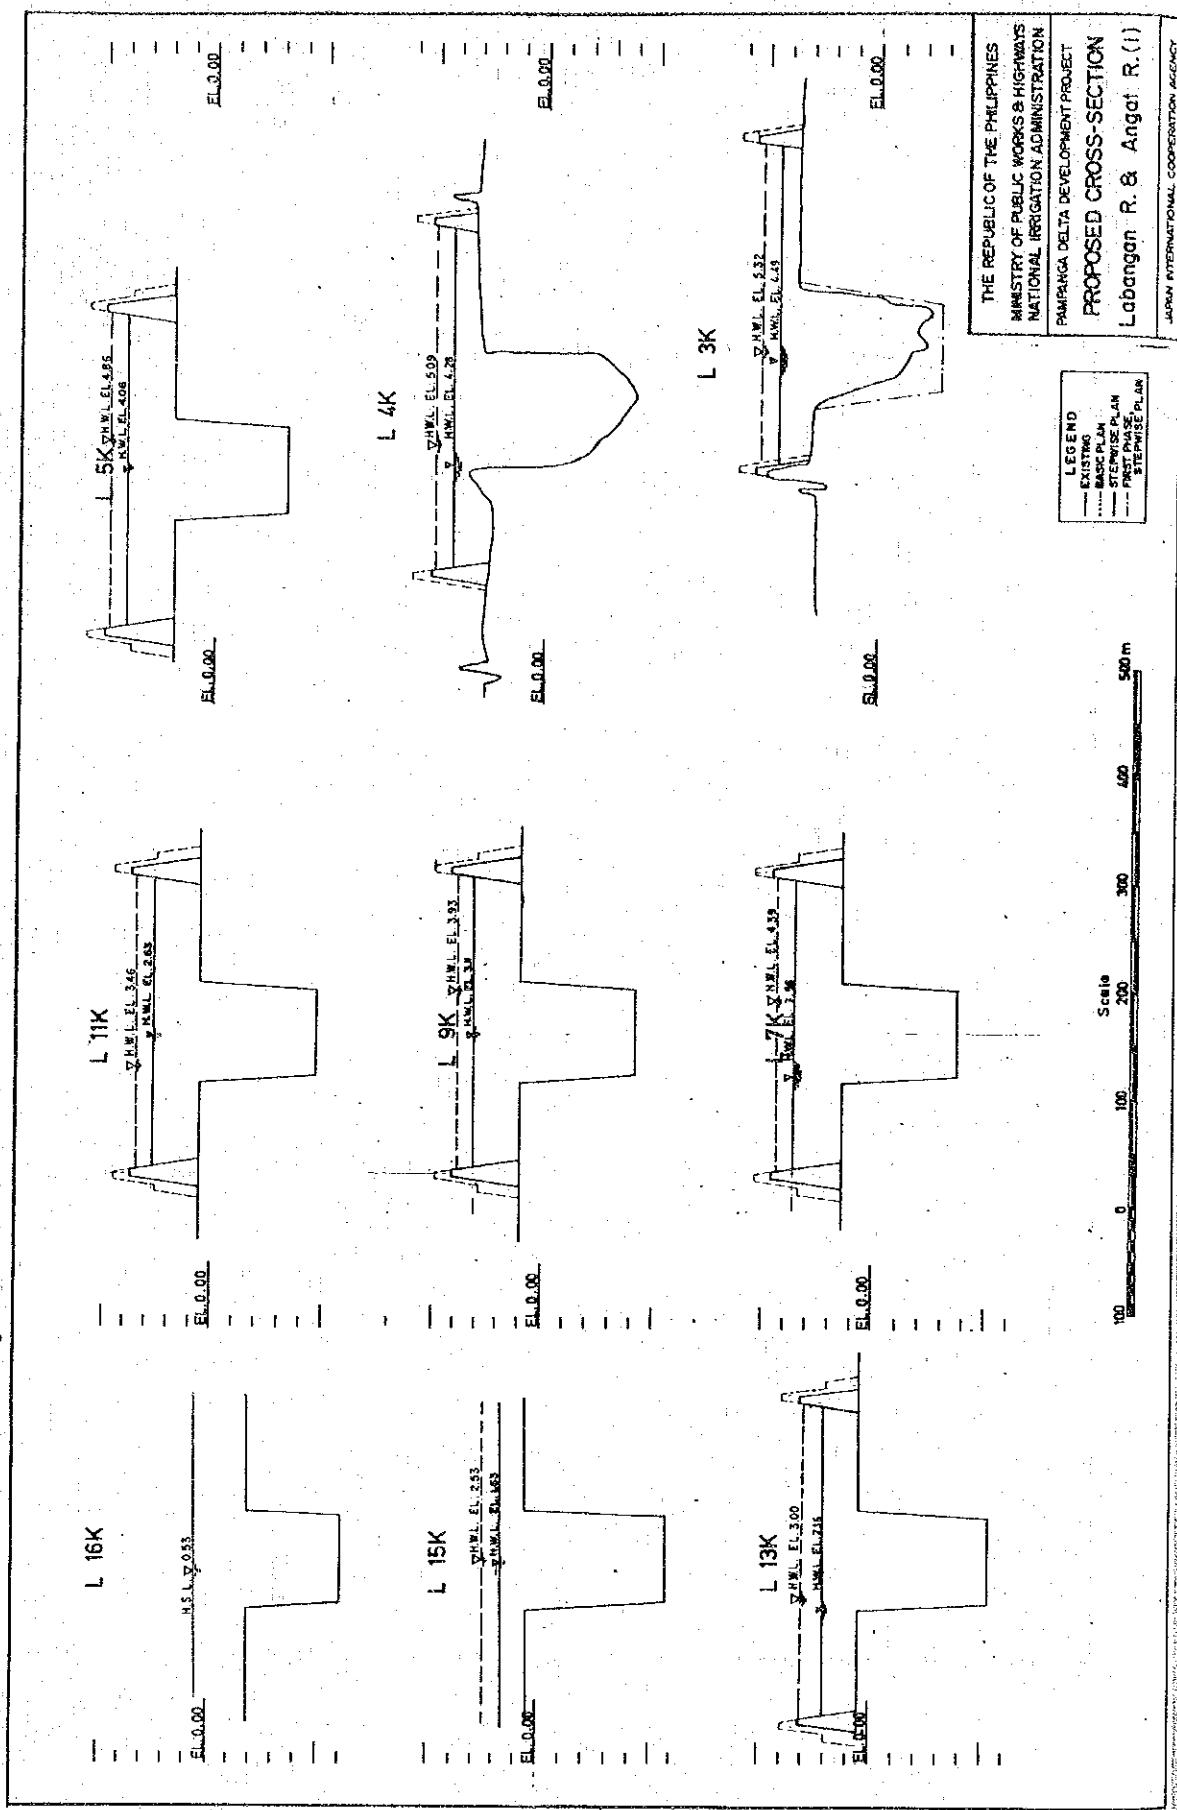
(14) PROPOSED CHANNEL CROSS-SECTION
